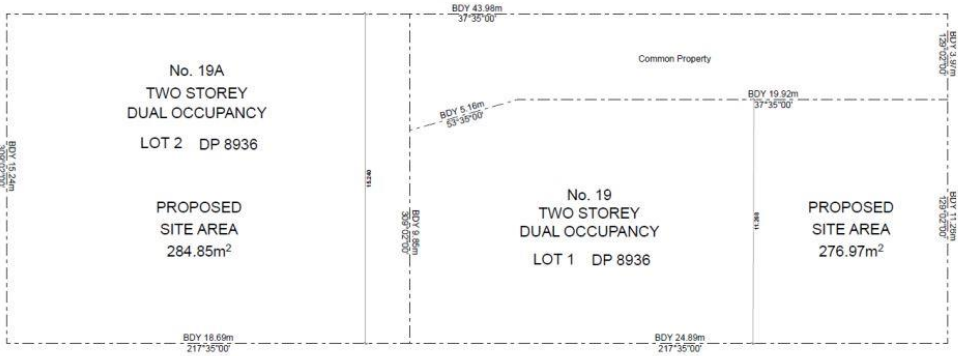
Site plan indicating the existing building footprints (Source: Subdivision Plans)
